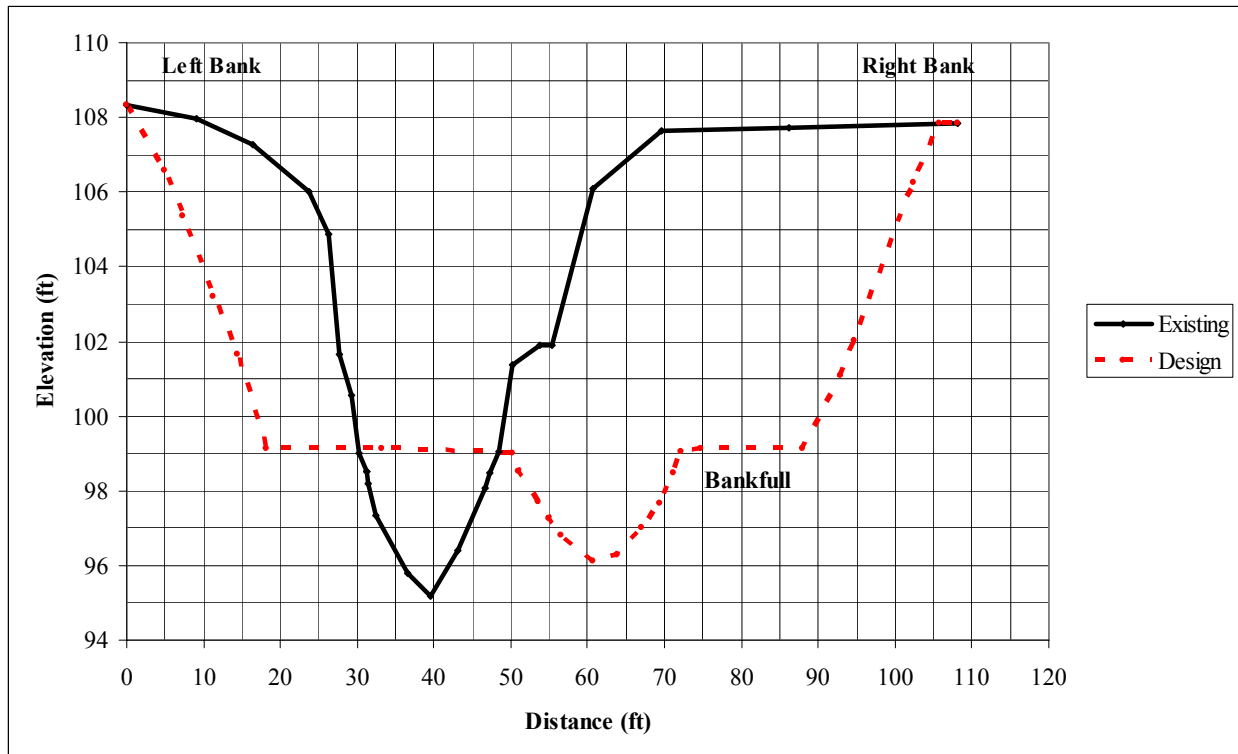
Reach 4 at Cross Section B Facing Downstream.
